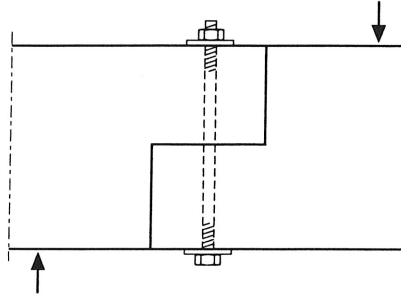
The simplest joint: the short beam is hanging in the cantilever. Where the forces are not too large, the beam can be supported directly on the cantilever.
